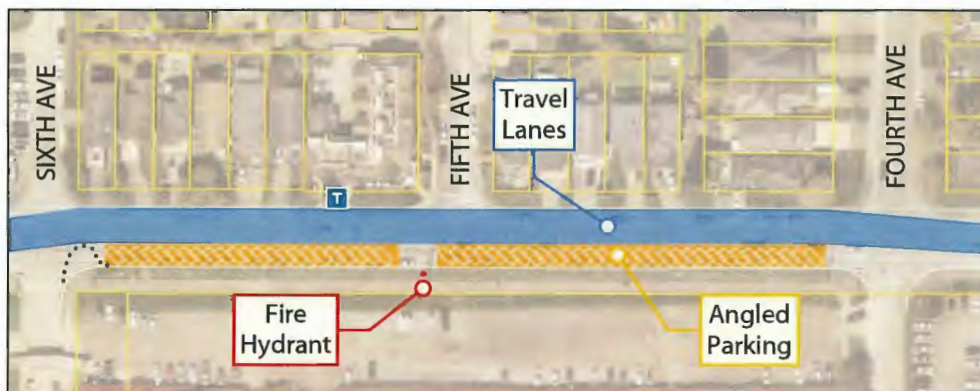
Angled Parking on Chatham Street between Fourth Avenue and Sixth Avenue
